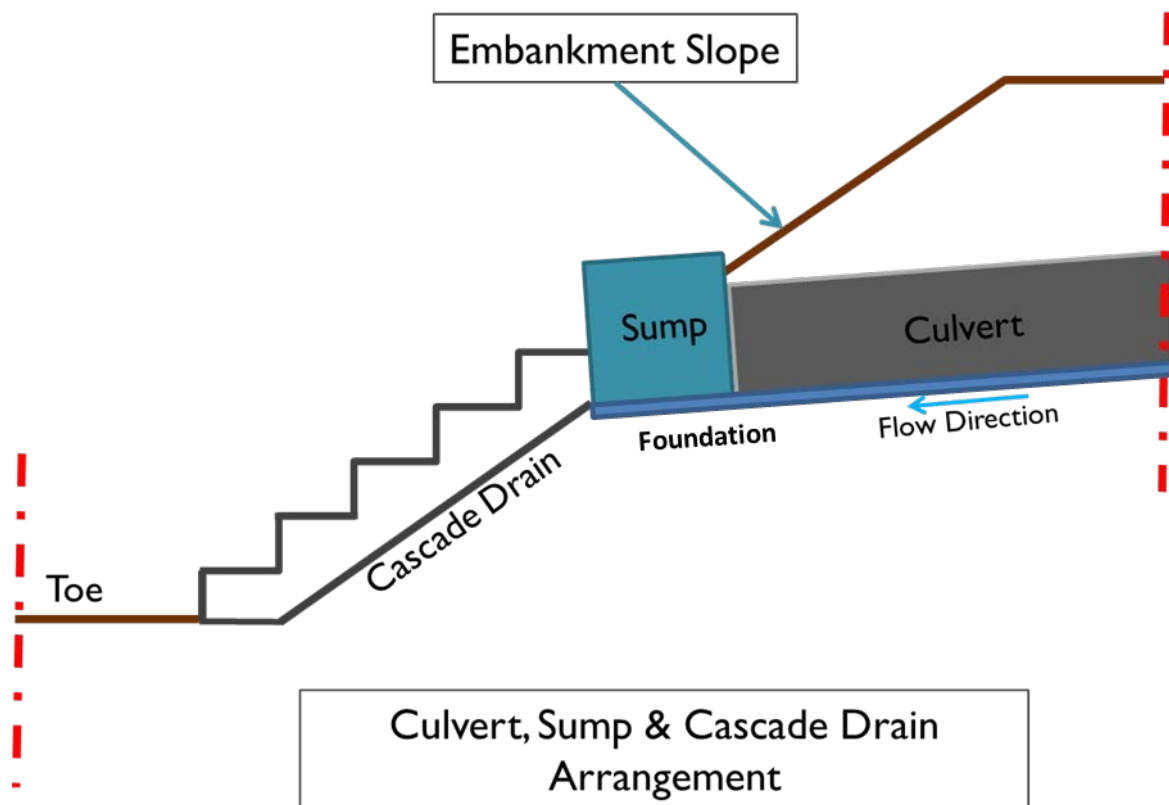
Culvert, Sump & Cascade Drain Arrangement
